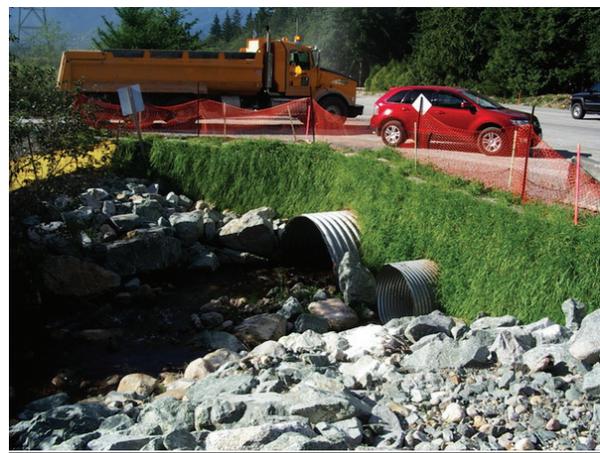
Deltalok Wall After Vegetation (Dryden Creek Culvert, Inlet Headwall)
